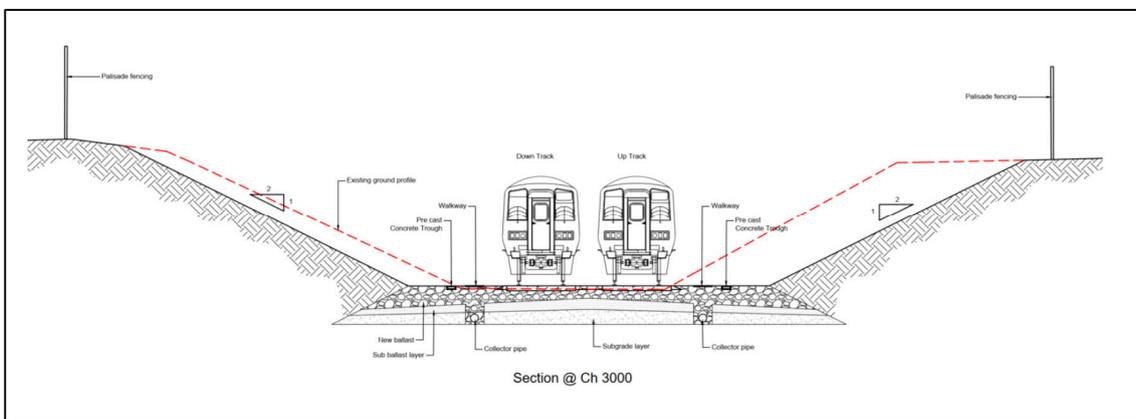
Typical Example of Twin Track and adjacent Embankment and Fencing
